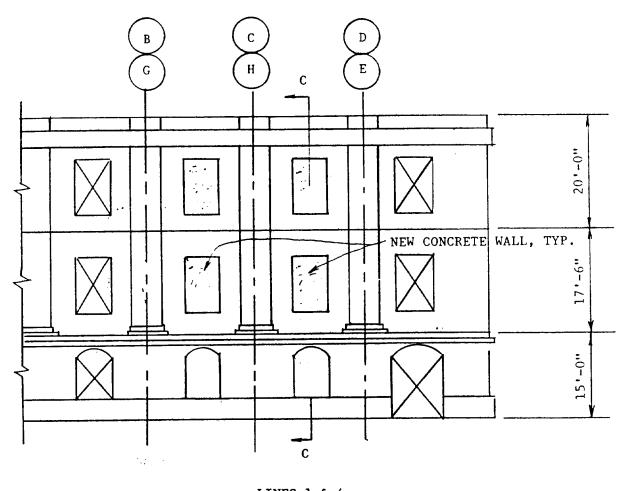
Brick building with concrete framing system. (Sheet 12 of 25)
